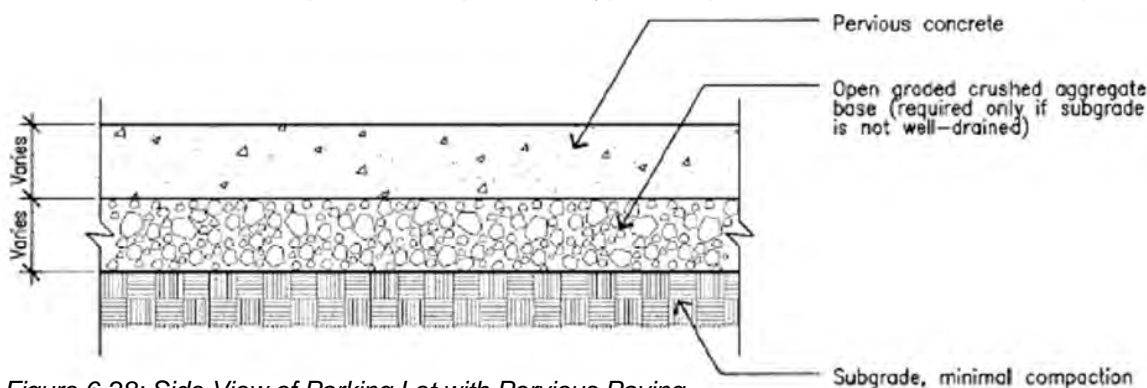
Side View of Parking Lot with Pervious Paving
